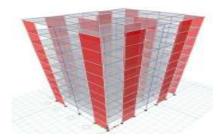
D Modeling of Building with 1.0% shear wall ratio
